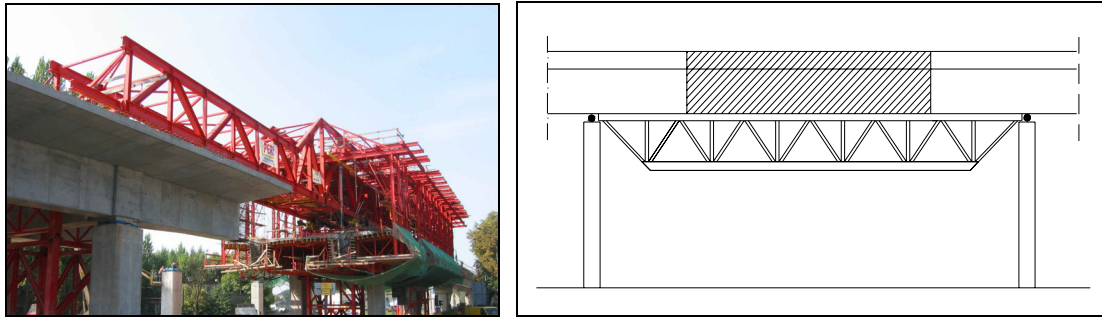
Left: Travelling gantry (Skanska SA in Poland). Right: Travelling girder.
